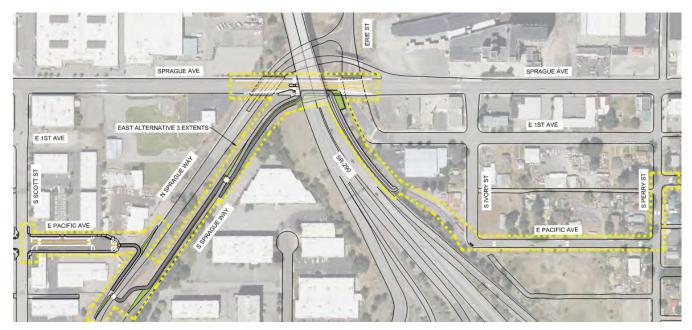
East Alternative 3 - S Sprague Way Proposed Layout
